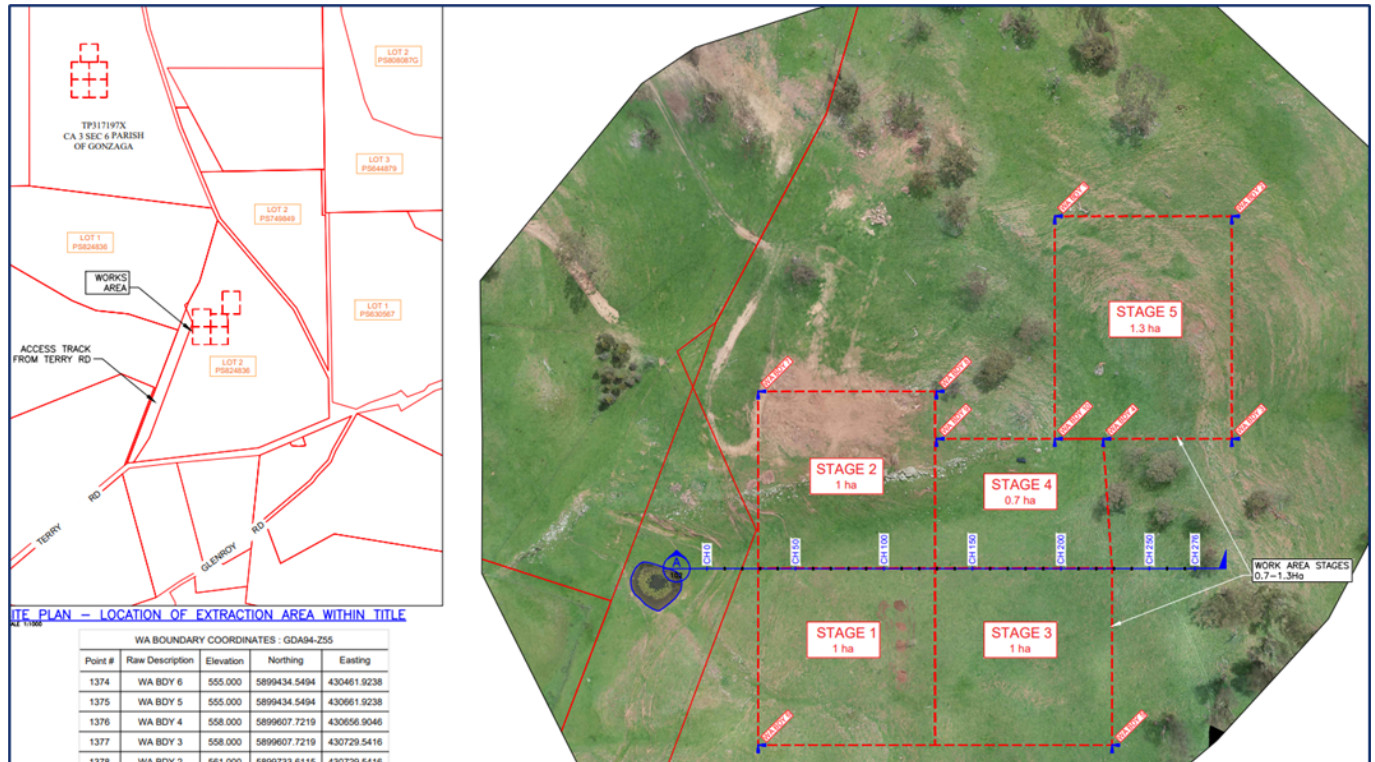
Proposed extraction sites in stages, submitted Operations Plan
